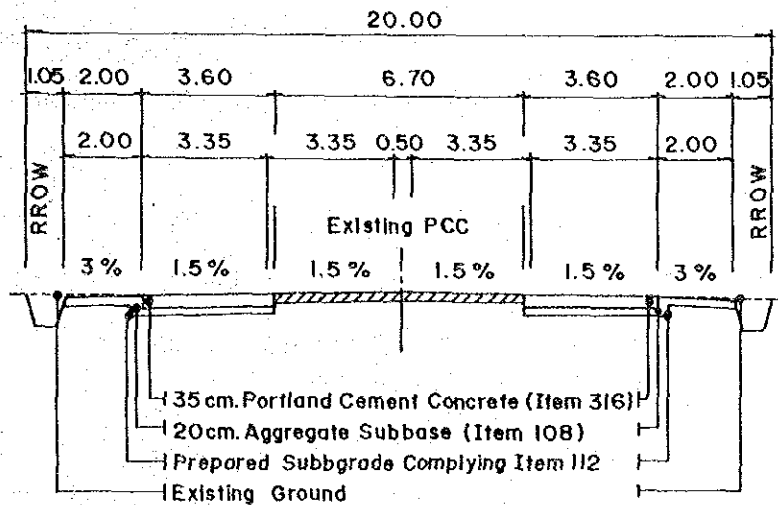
PROPOSED WIDENING TO FOUR LANES
